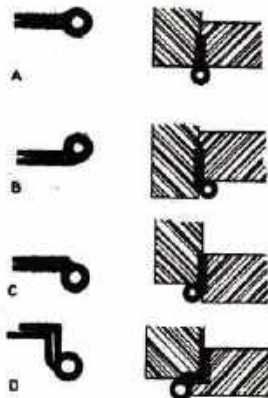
A STRAIGHT HINGE (B,C) CRANK LEFT DOOR (D) CRANK
